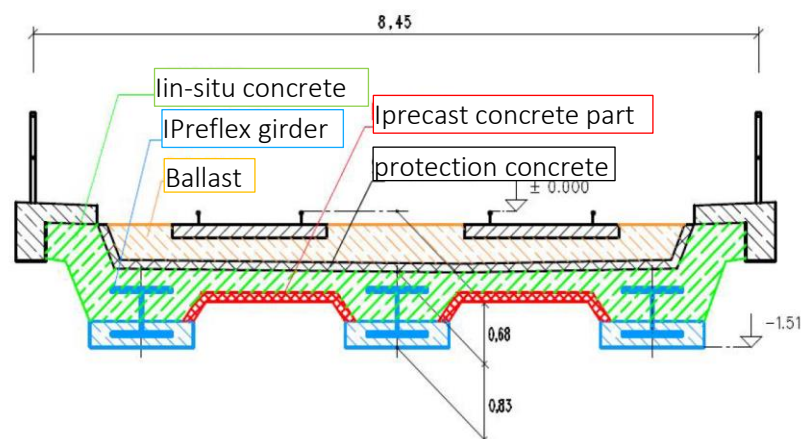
railway bridge cross section with Preflex girder [C+P Brückenbau GmbH & C. KG, Bad Homburg]
